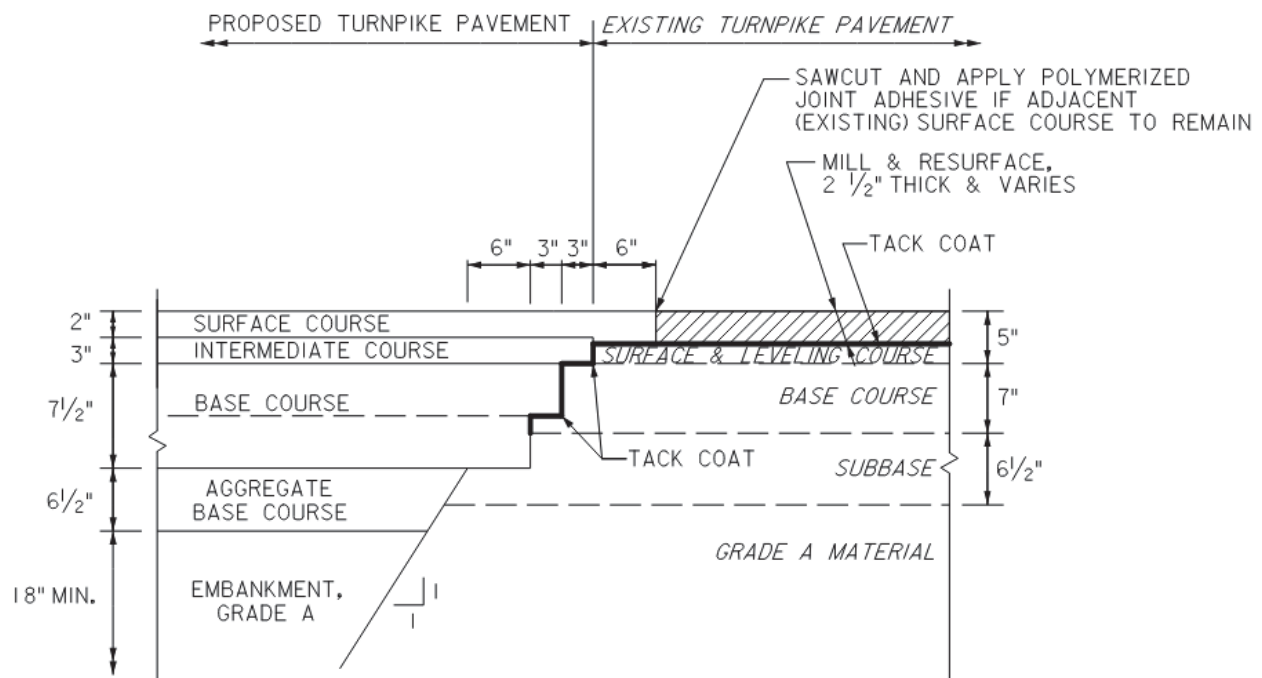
Turnpike Toll Plaza Pavement Interface
